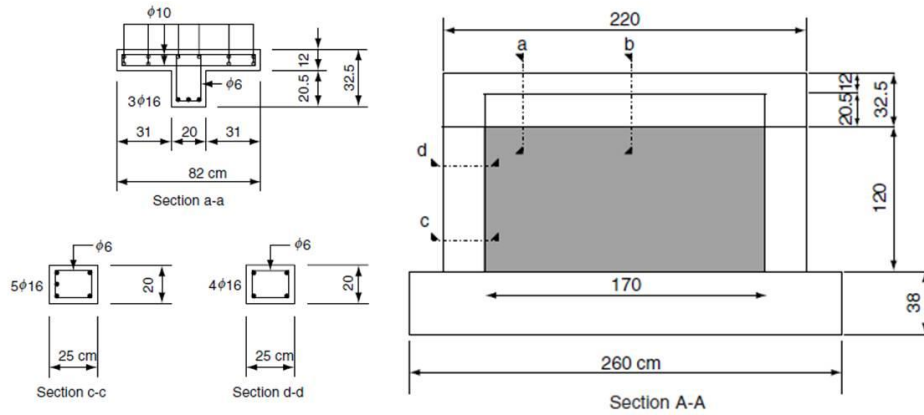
Test specimen and reinforcement details (Teymur et al. 2012)
